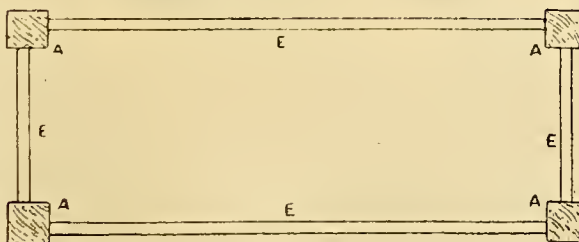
PLAN ON LINE C D, IN FIG. 2. Scale, 1 inch to 1 foot.
